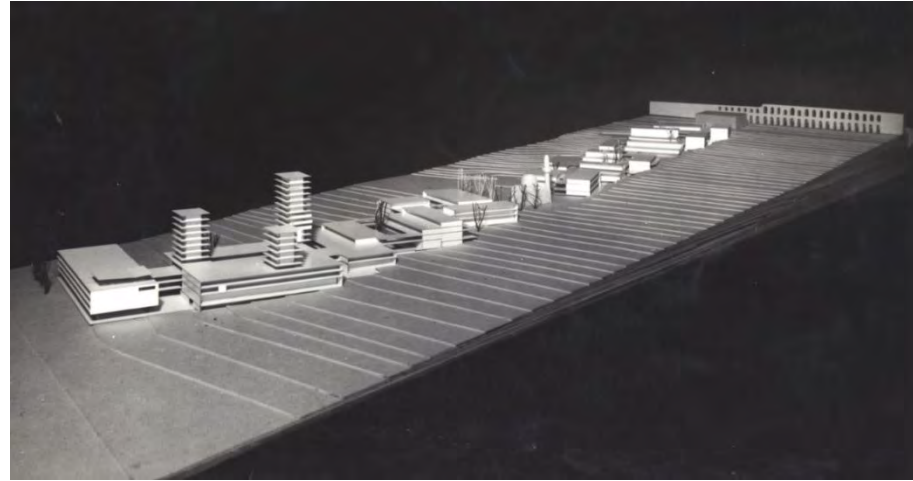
Project of Site Architectural Office (Salt Araştırma, 2022a)
